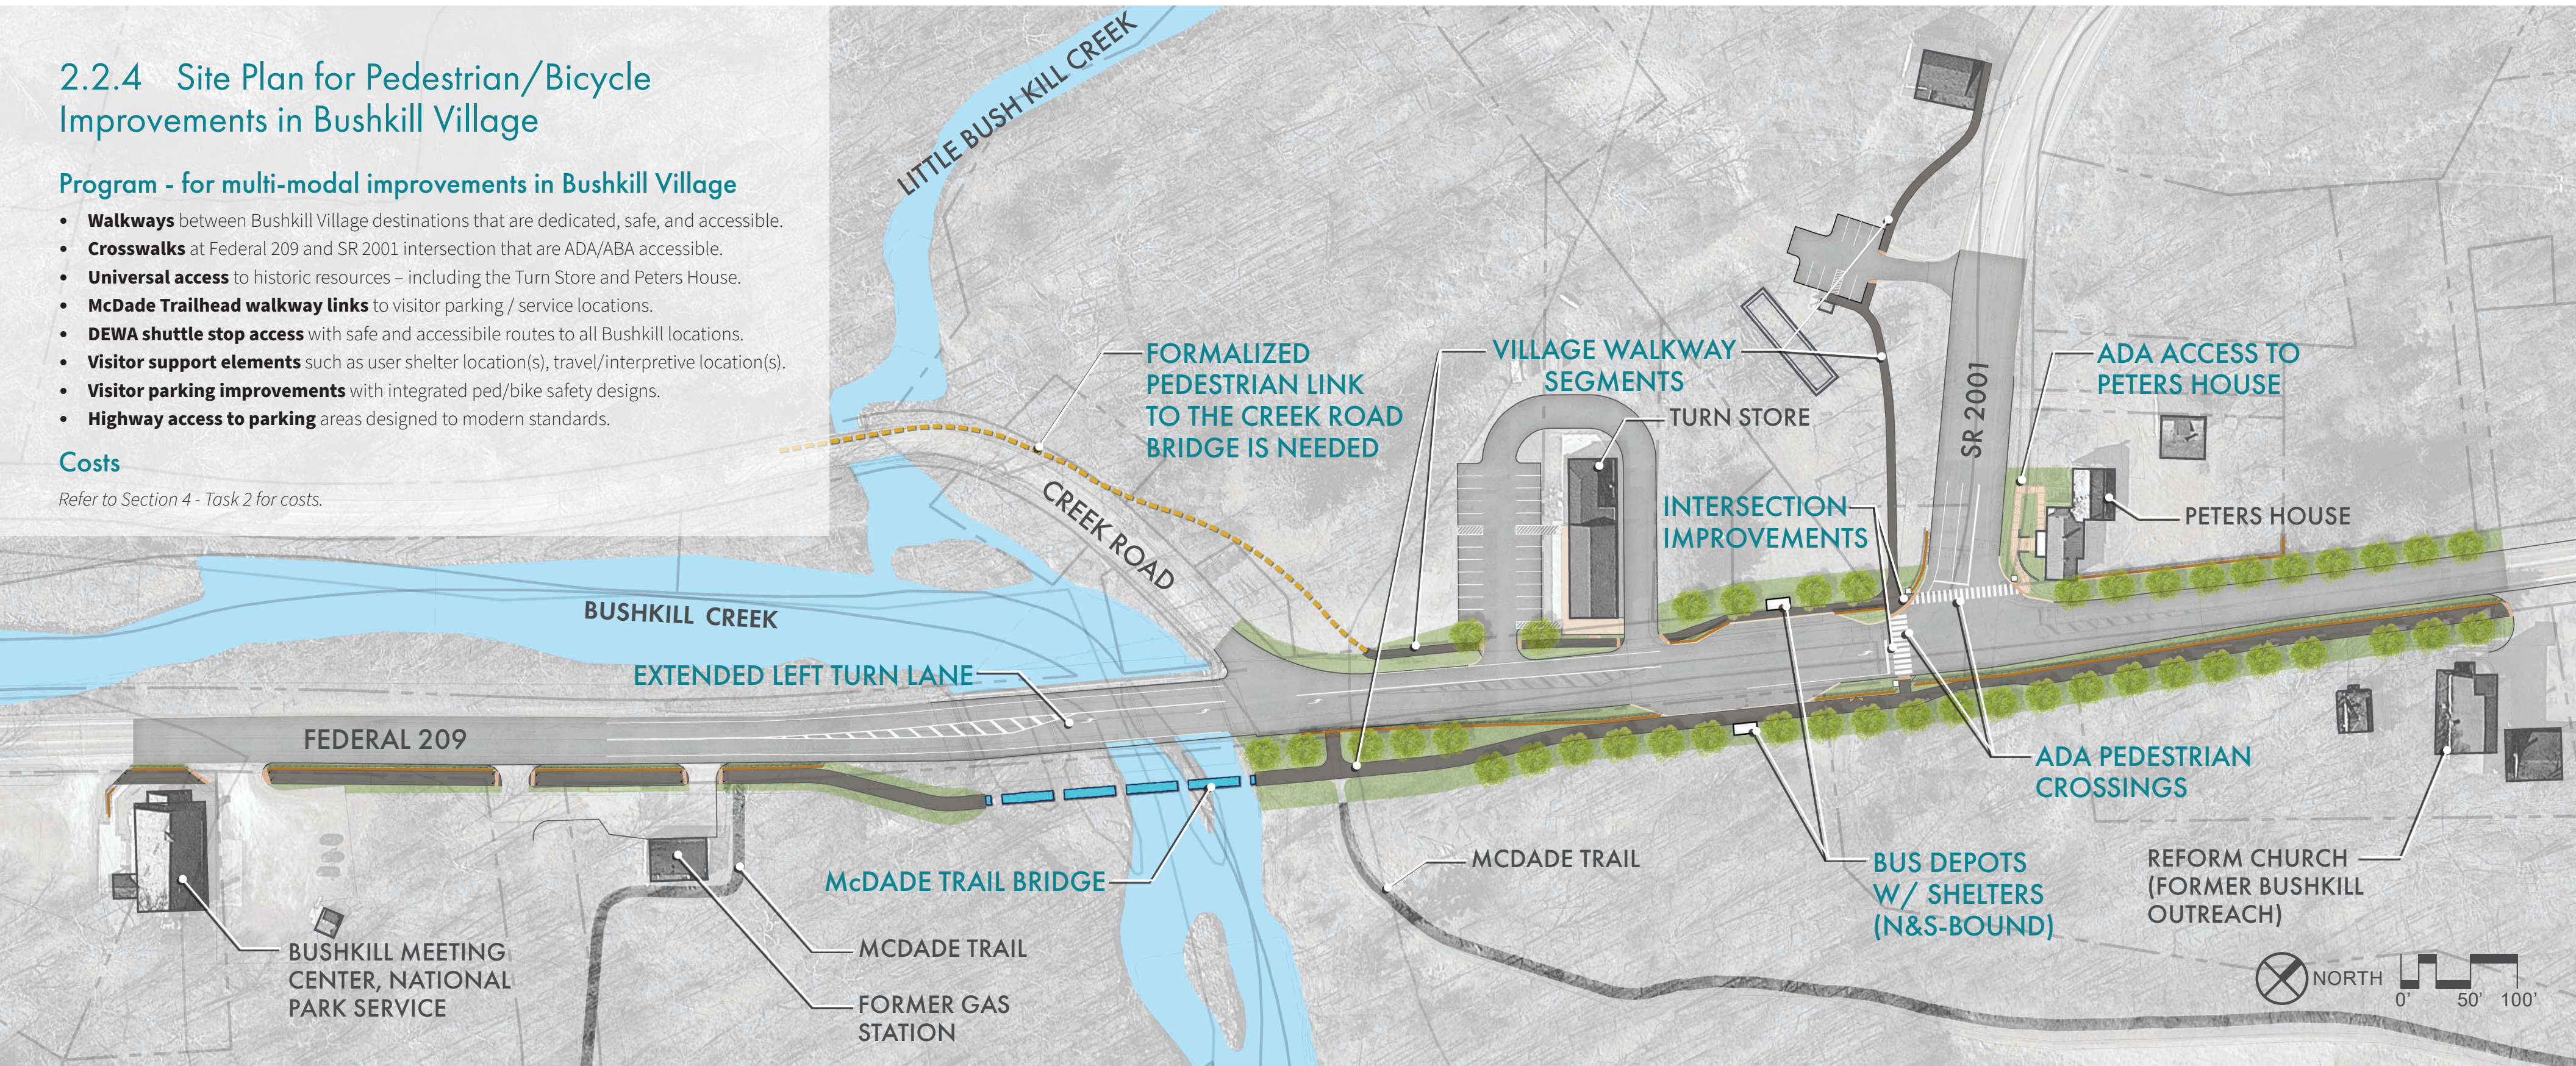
Site Plan for Pedestrian-Bicycle Improvements in Bushkill Village. Note - preliminary engineering for future lane reconfigurations of Federal 209 are shown.
